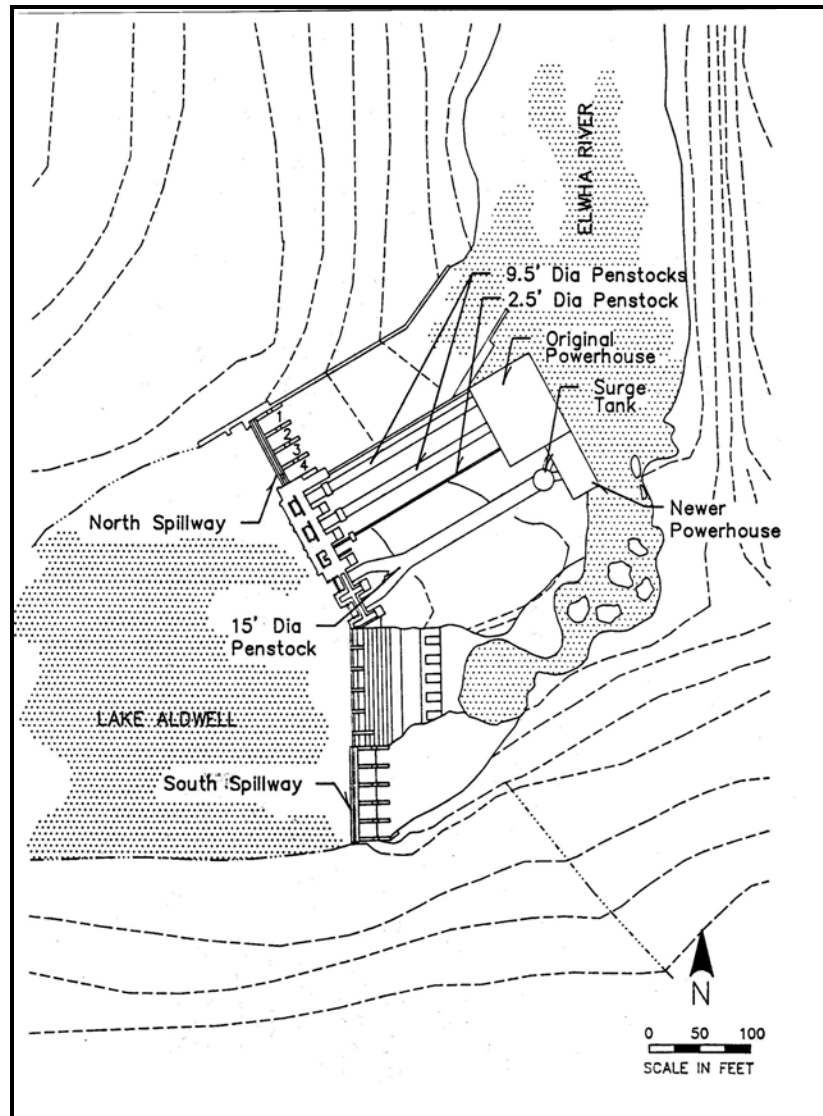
Site plan for Elwha Dam and powerhouses (from FERC 1993).
